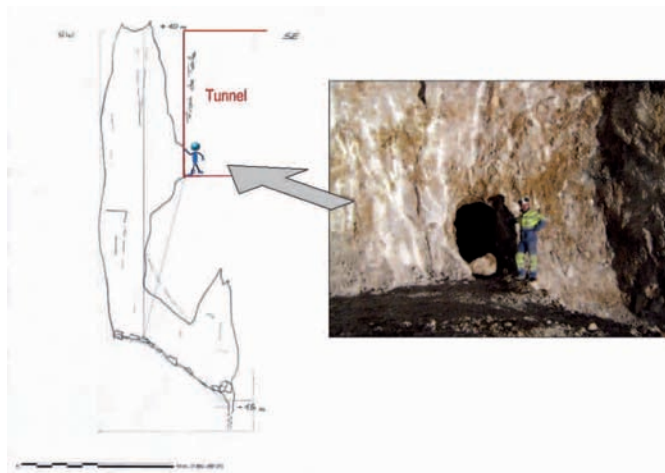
opening of a karst at the front face during excavation Bois de Peu tunnel (source: CETU)
